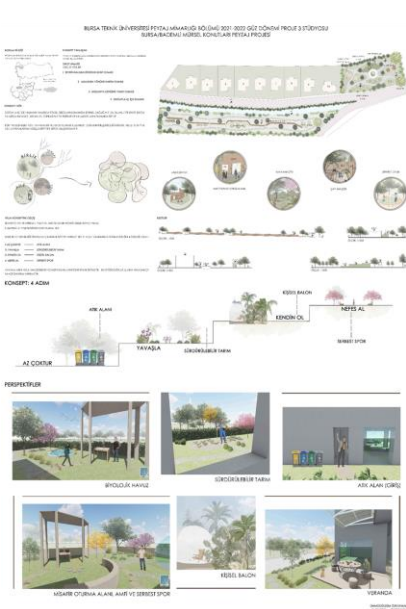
Concept Approach and Technical Drawing Sheets (Ümmügülüm Özkaymak)
